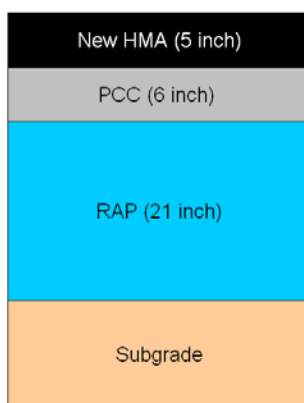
Pavement structure layout of NCAT Section 2 (not to scale).
